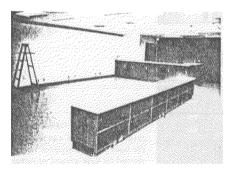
Anchorage must be provided for all counters whether they are located against a wall or out in the working spaces.
